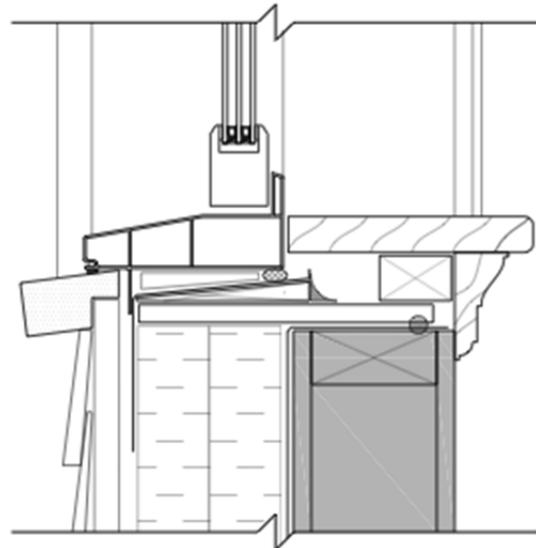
New window rough opening framed with and extension box to allow for the addition of exterior insulation
